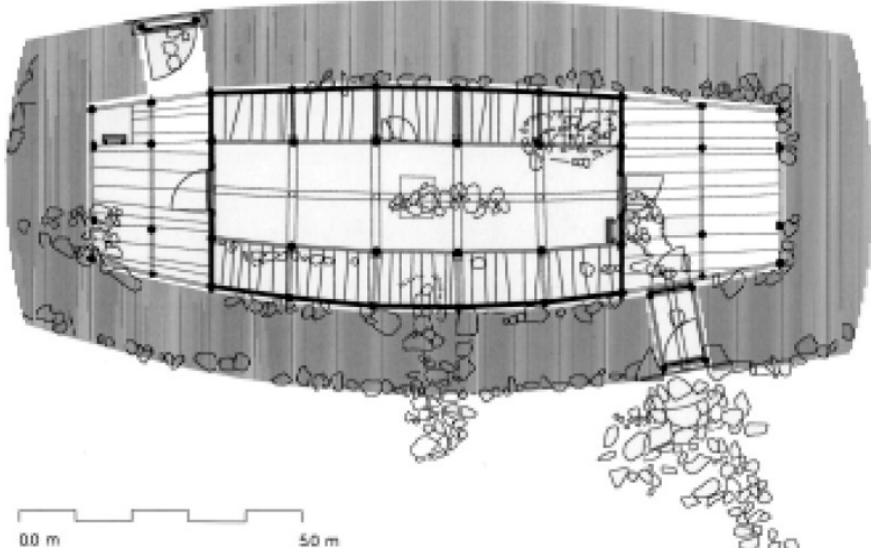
A schematic reconstructed plan of a Viking long-house based on a site excavation of a Viking site. It is a typical dwelling, either for pit-houses or for above the ground wooden structures Vikings used to build. The space is developed around a fire heart, with a central opening in the roof structure. In-between the vertical structural elements, on the sides, there used to be sleeping platforms and benches, creating a communal living for extended families. Source: – Gretar Markúson, Stefán Örn Stefánsson, <https://www.thjodminjasafn.is/media/rannsoknir/1998-11-Eiriksstadir-i-Haukadal.pdf>, p.29, date accessed 2025, April 23
